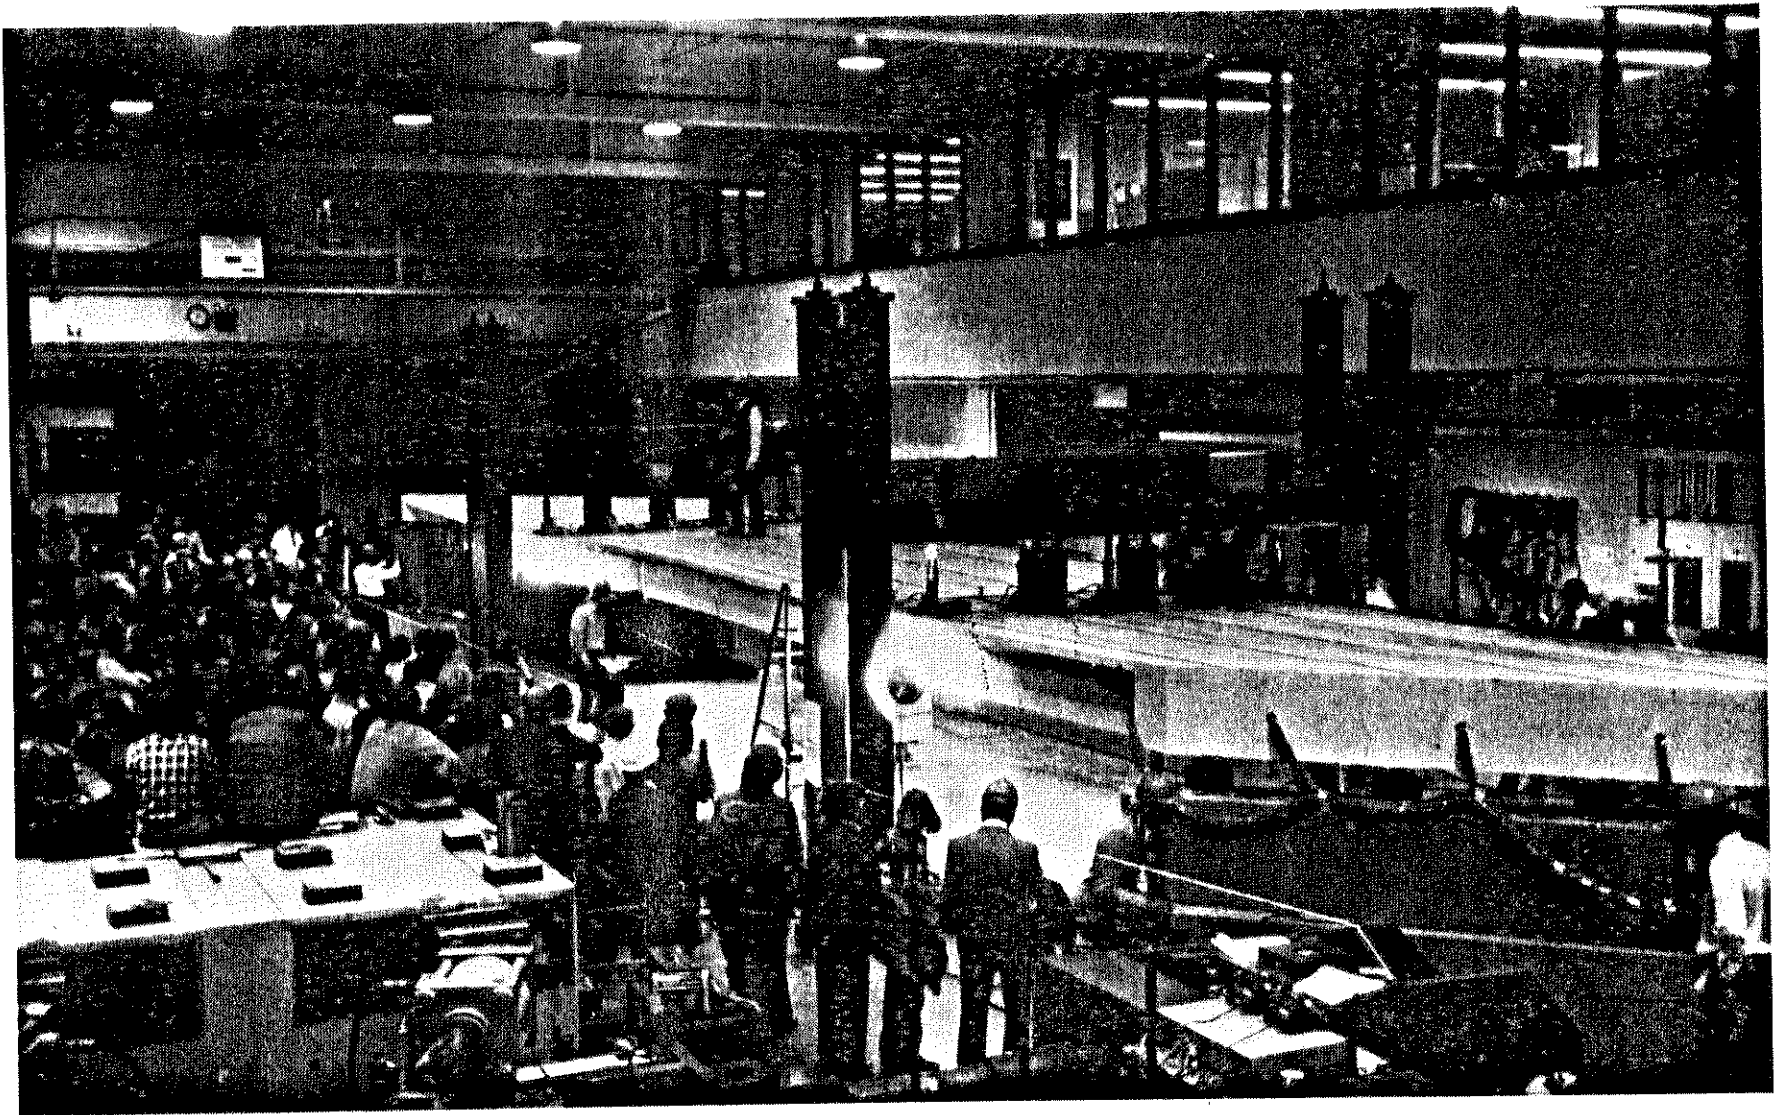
FINAL LOAD TEST ON SKEW BOX GIRDER BRIDGE MODEL
